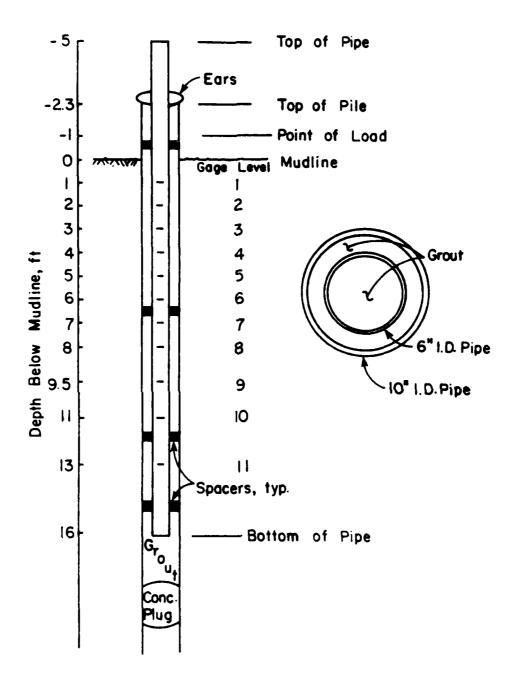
Schematic Drawing of Pile and instrumented Pipe
